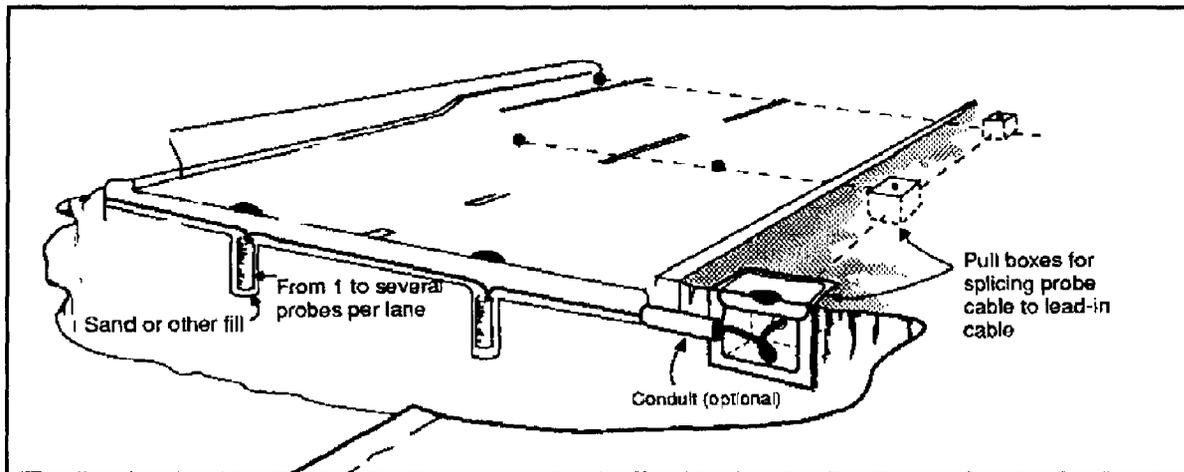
Typical Layout for Magnetometer Installation.⁽⁴⁾
